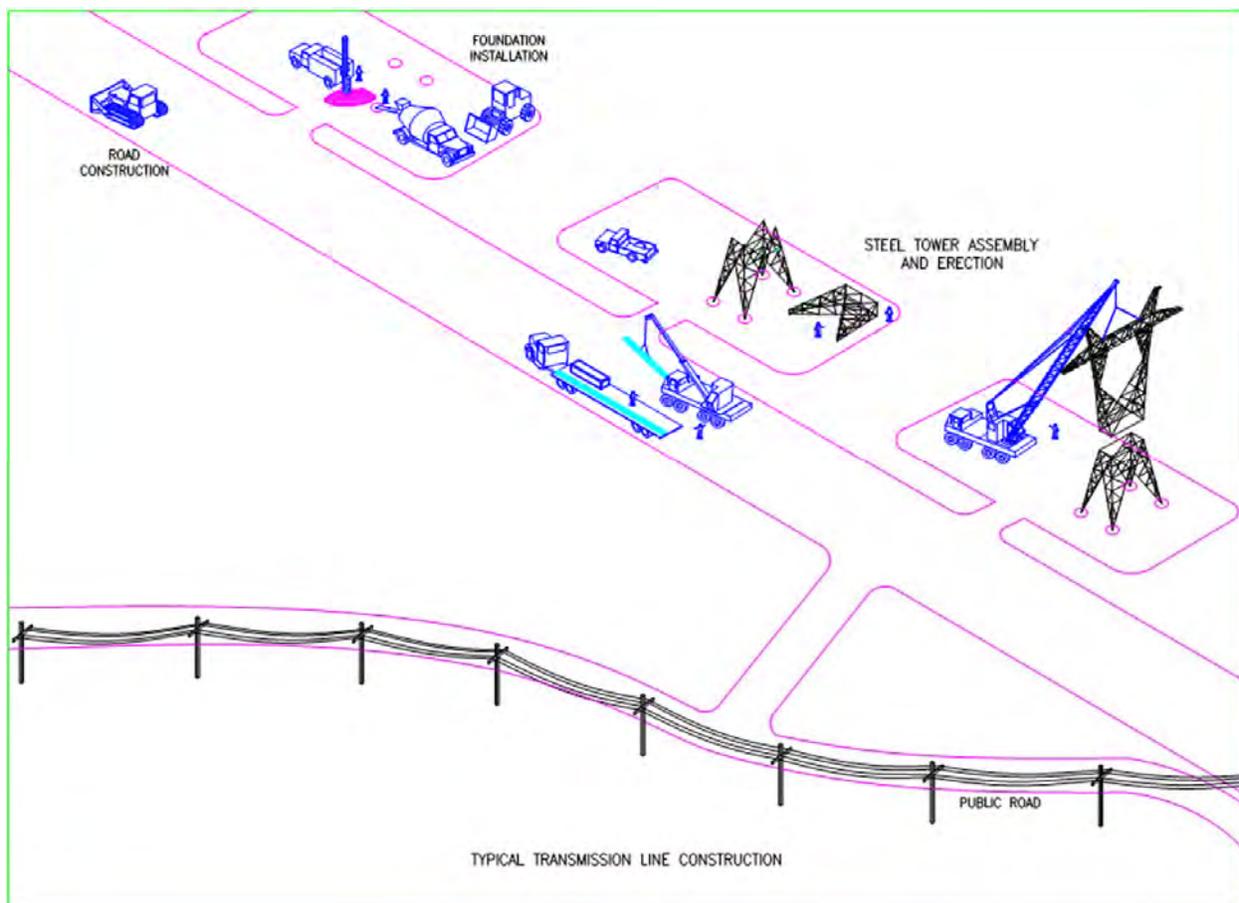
Foundation Installation, Tower Assembly, and Tower Erection
